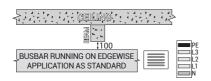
CROSSING UNDER A BEAM ON EDGEWISE APPLICATION
